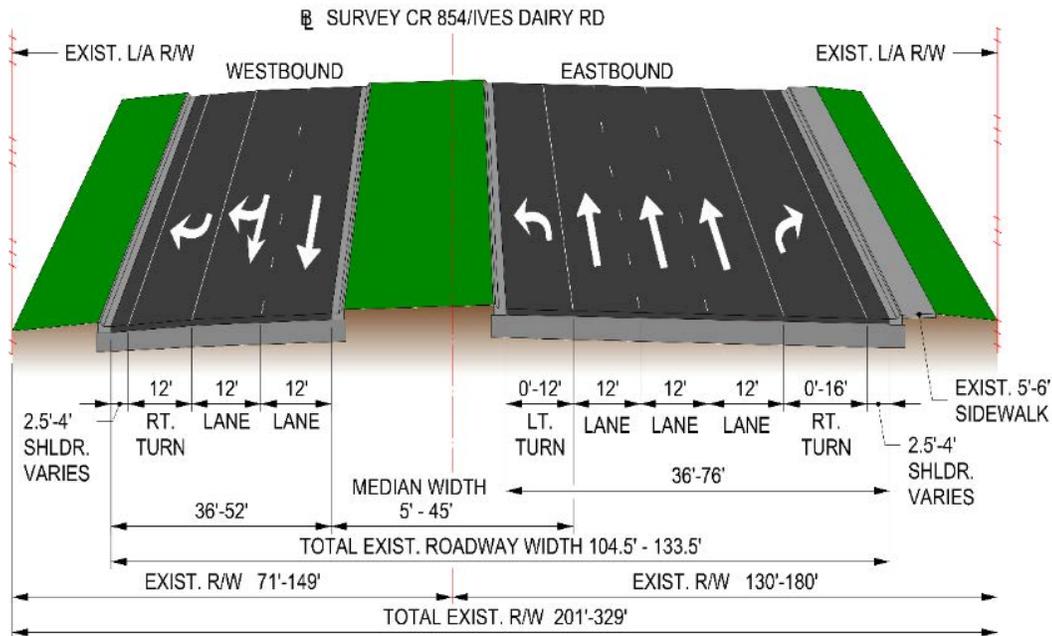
5: Existing Typical Section – CR 854/Ives Dairy Road
